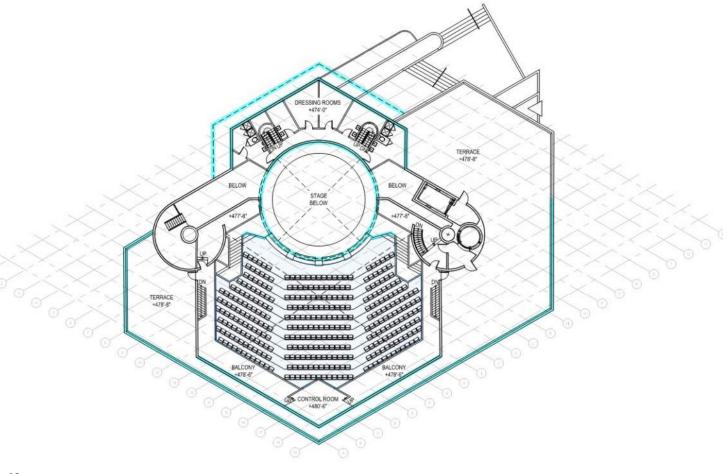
Plan diagram showing extents of shoring required for removal of house floor highlighted in blue
